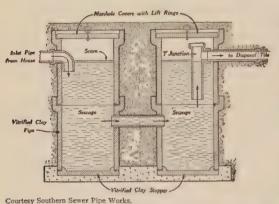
Septic tank of vitrified tile. Two-section tank has sufficient capacity for 6 people. An additional section may be added to care for not more than 10 people. (See also Fig. 20.)
